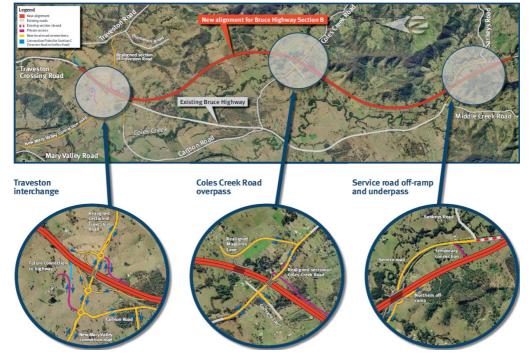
Figure I Bruce Highway upgrade: Cooroy to Curra Section B
